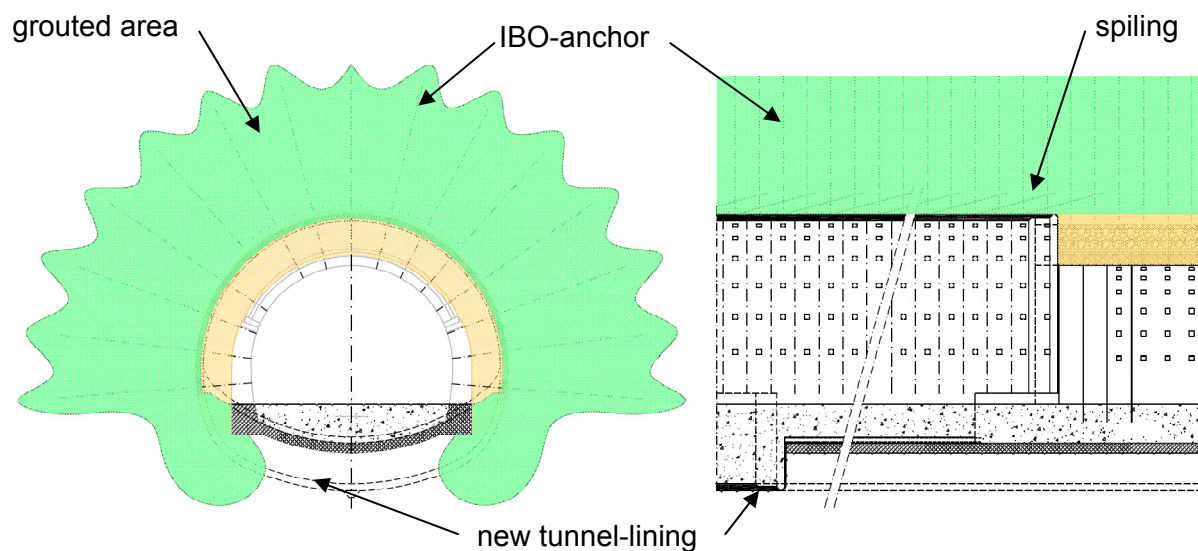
, overview grouting- and tunnelling activities (source Beton- und Monierbau)
